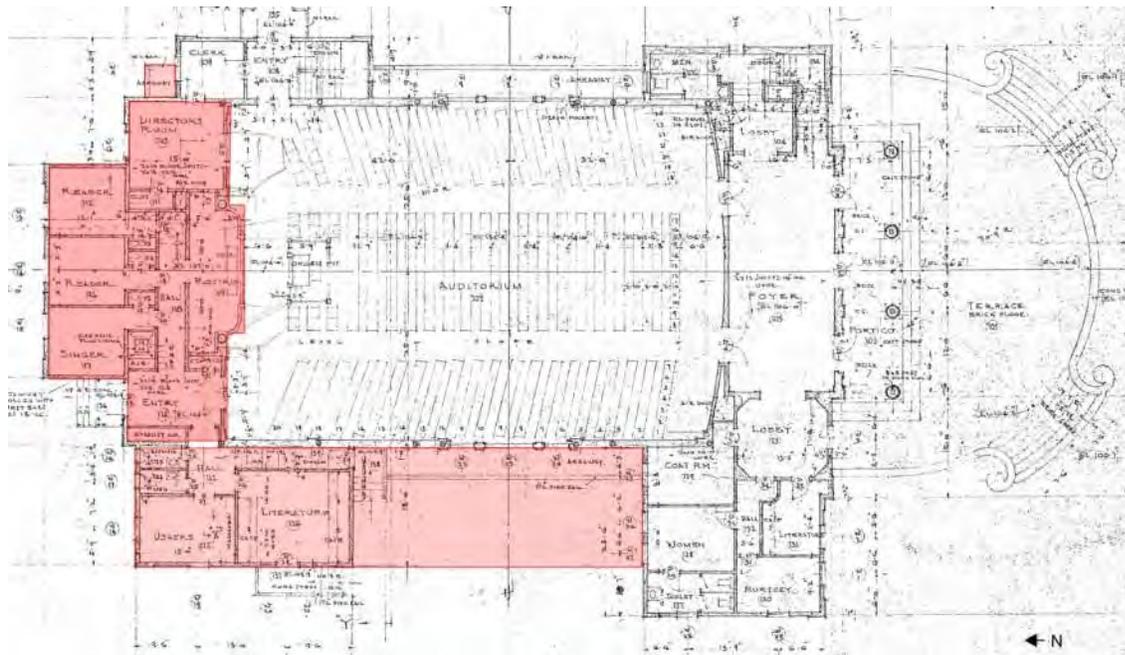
First floor plan view from the 1938 Construction Drawings highlighting the areas demolished in 2002.
